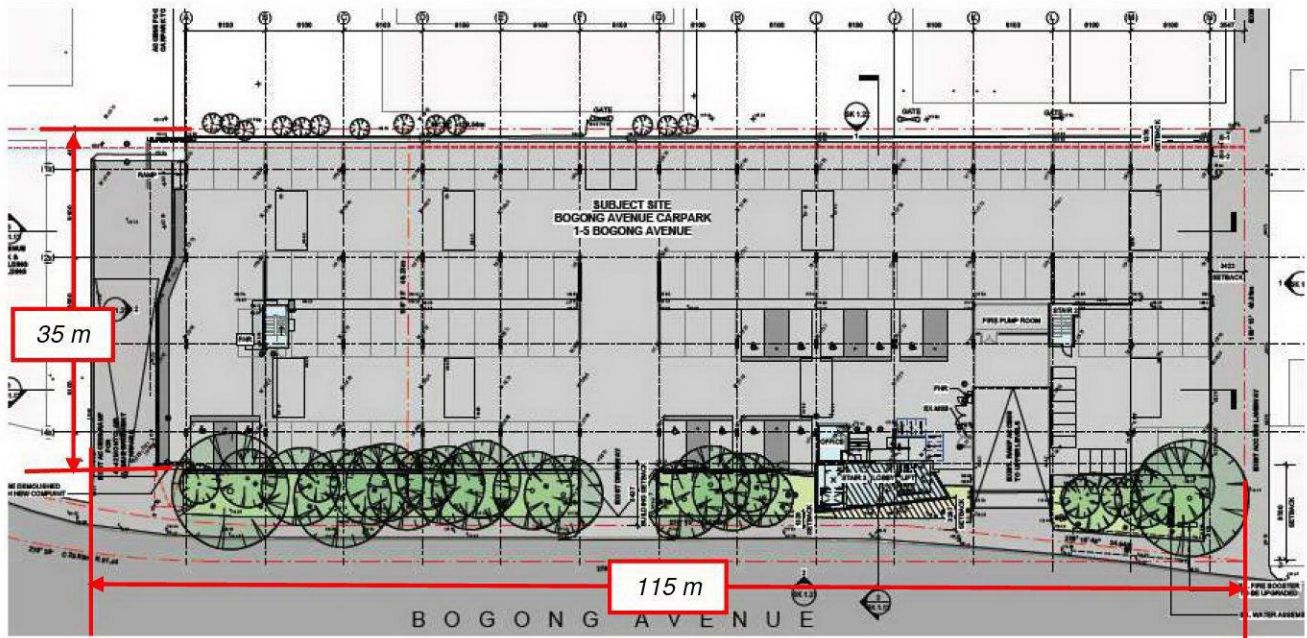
Ground floor plans with the plan-form dimensions overlaid.
